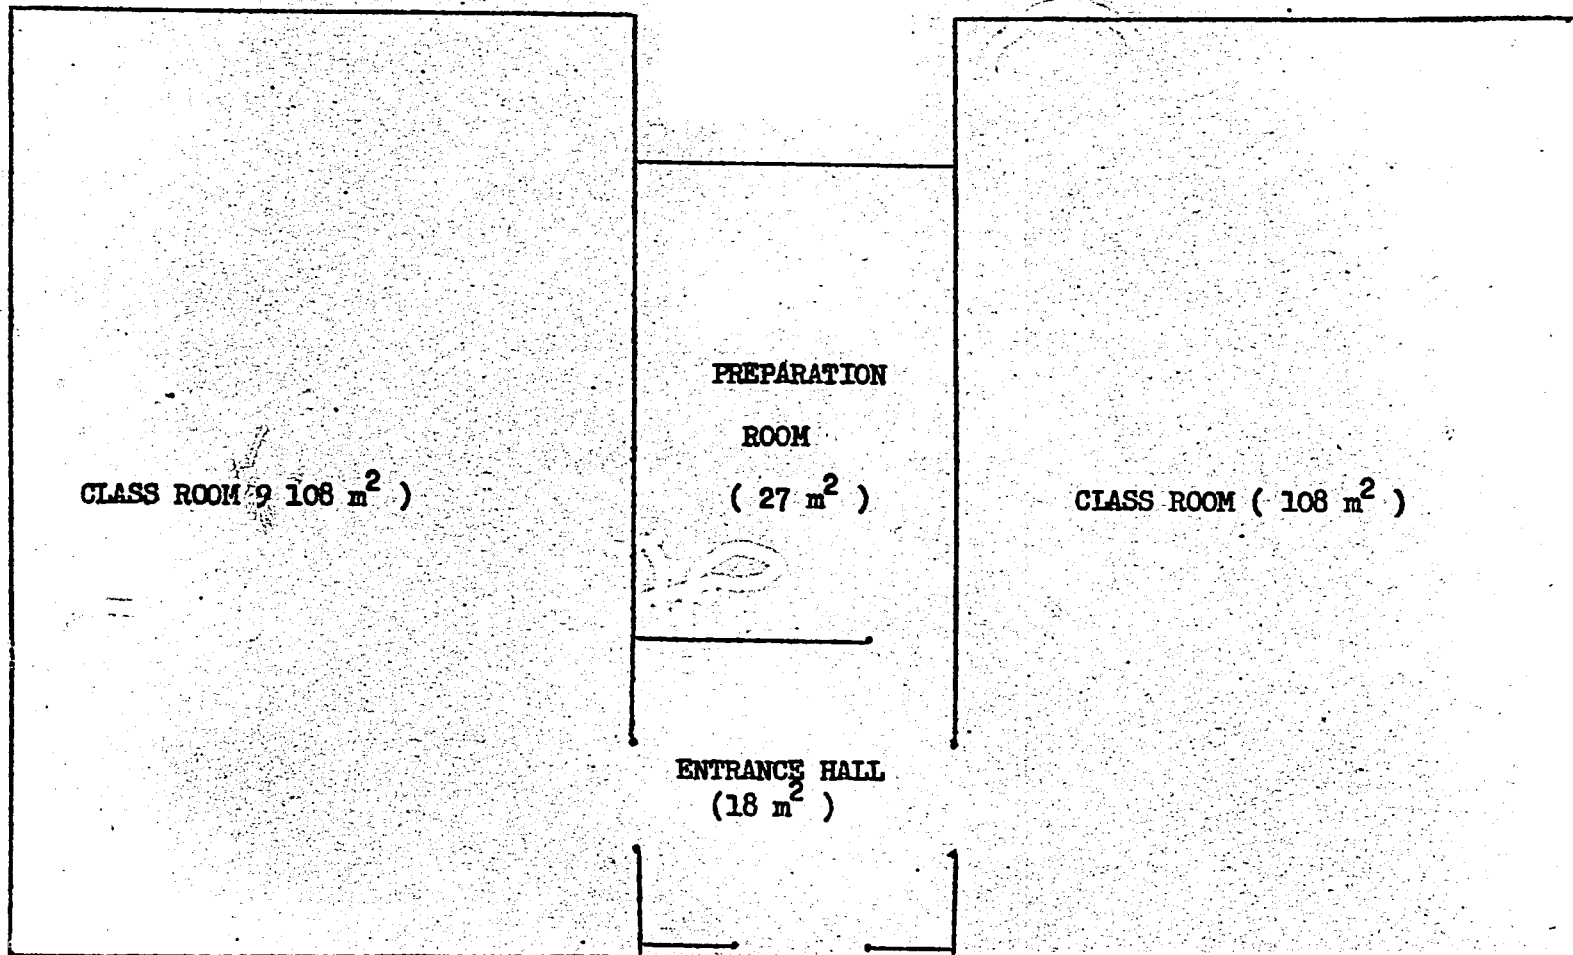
GENERALIZED FLOOR PLAN OF A TYPICAL LABORATORY SECTION WITH A TOTAL AREA OF 279 Sq.m.
